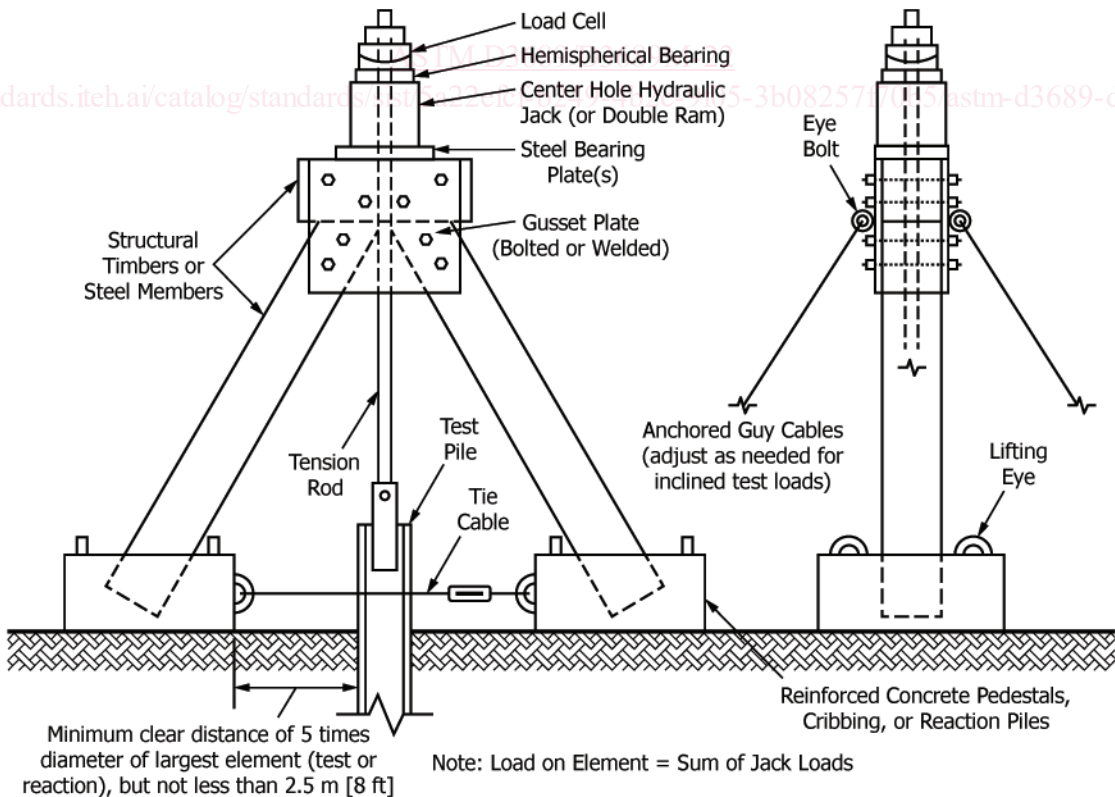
Typical Setup for Tensile Load Test Using Hydraulic Jack(s) Acting at Top of an A-frame
